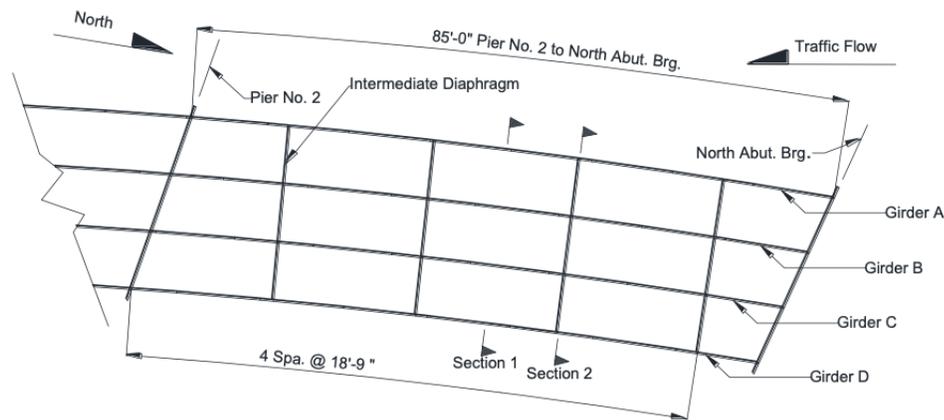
Plan View of Bridge 309 Instrumentation Sections [7]
